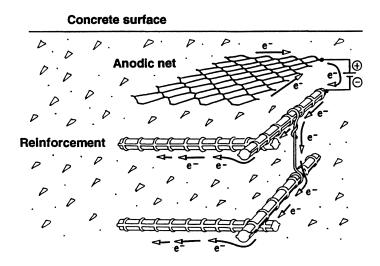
Illustration of cathodic protection of reinforcing steel in concrete /18/.
